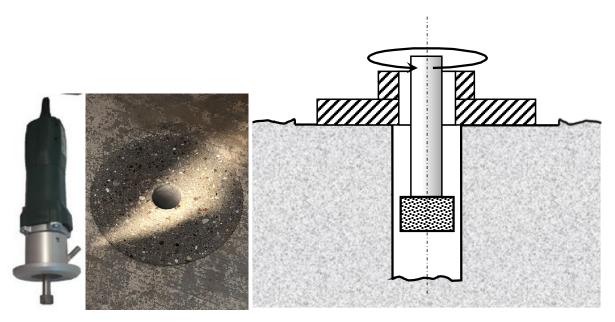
The centering brass rod is inserted in the hole and the diamond planning wheel is centered on the rod's top. Planning takes place with water cooled to a 1/10 in. depth by pressing the units axel connected to the drill machine against the surface, which has to be plane in its total circumference.
